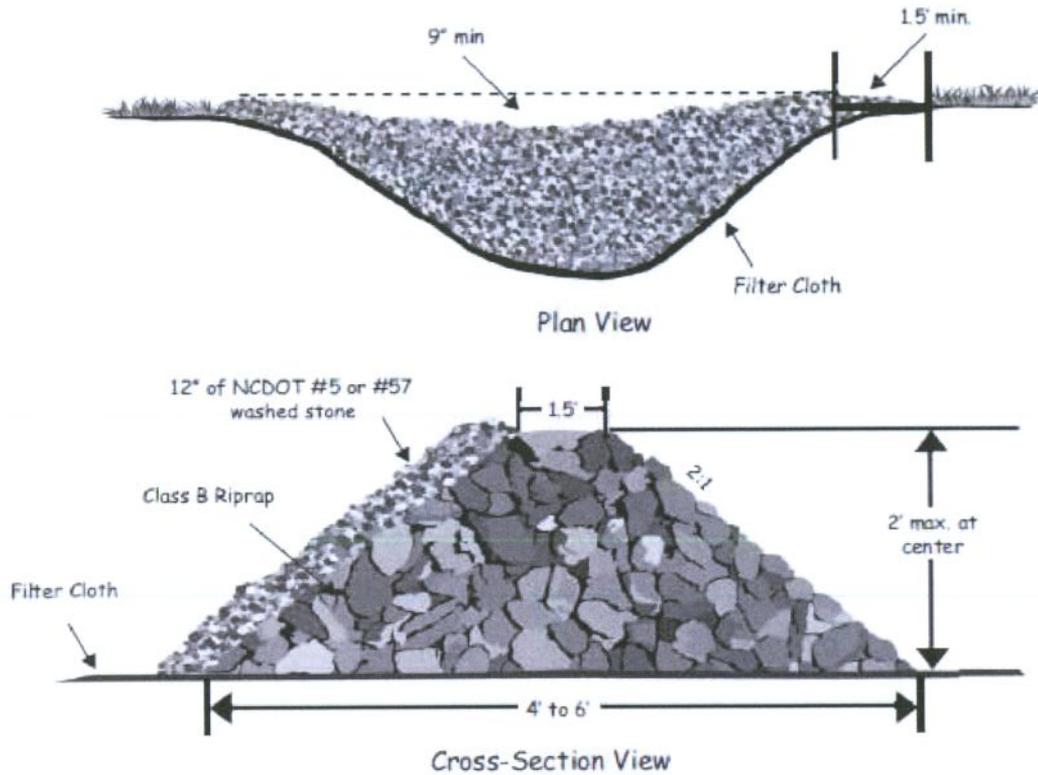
Stone check dam stone should be placed over the channel banks to keep water from cutting around the dam.
